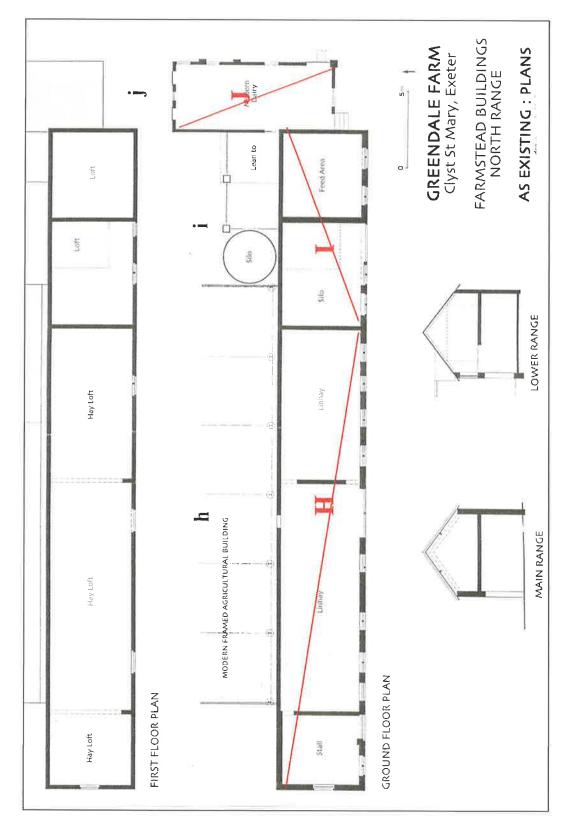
Plans and cross-sections of the North-West (Building H) and North-East (Building I) ranges and the Modern Dairy (Building J).
